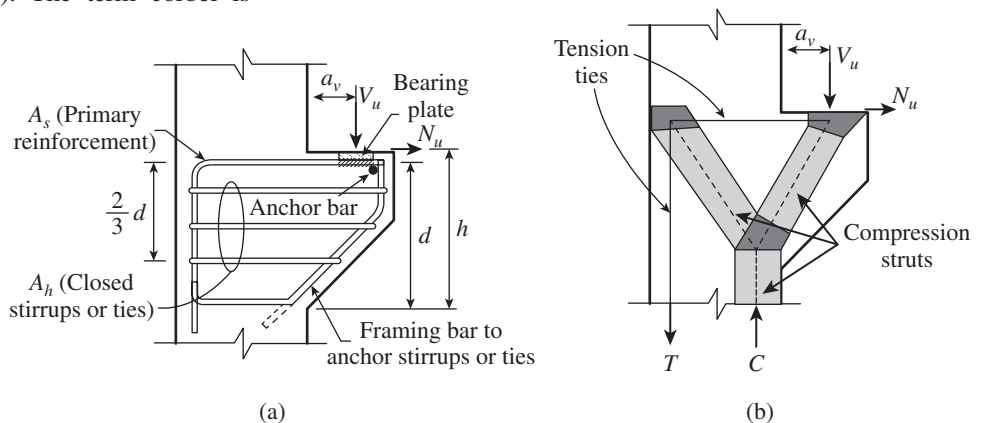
Typical corbel (a) Reinforcement details (b) Strut-and-tie model (Reprinted with permission from ACI)
